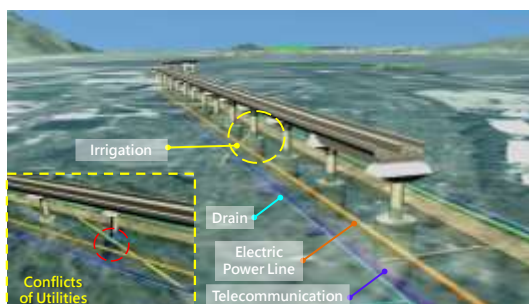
Conflict between bridge piers and utilities, Sanyin Line
